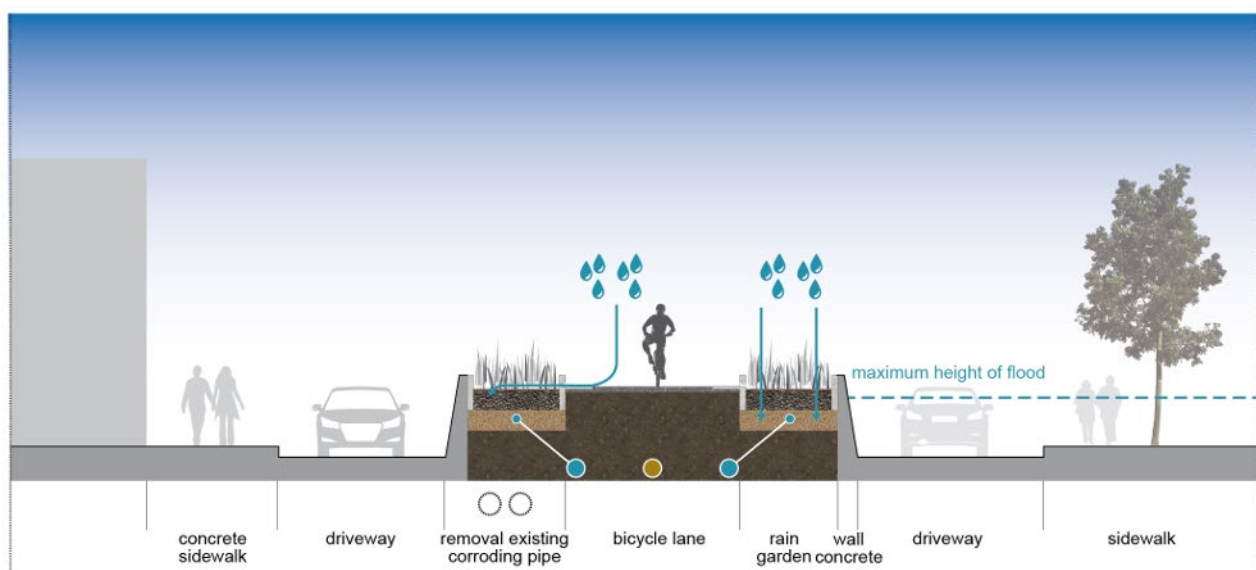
San Rafael, section of Canal Street. Source: original drawing by arch. M. Padrone.
